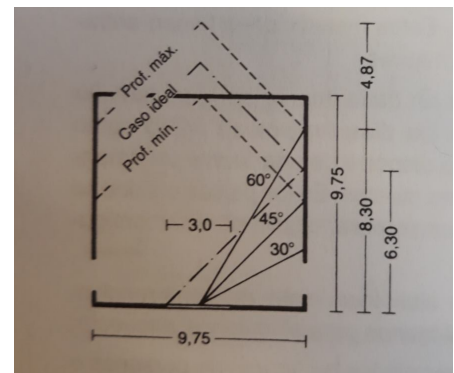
Floor plan. Exhibition space with lateral natural light. Surface for exposition between 30° and 60°, room-high of 6.7 meters
